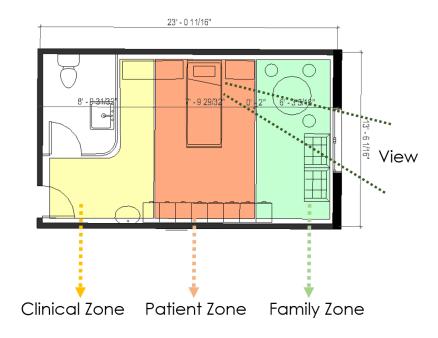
Enlarged Patient's Room Plan (Image credit by author)
